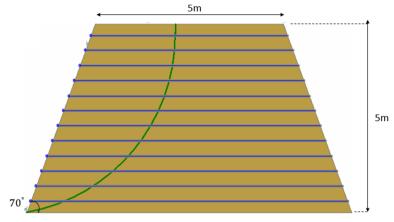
Potential failure plane of the Han Great Wall, assuming the reinforcements were continuous (FS = 2.07)
